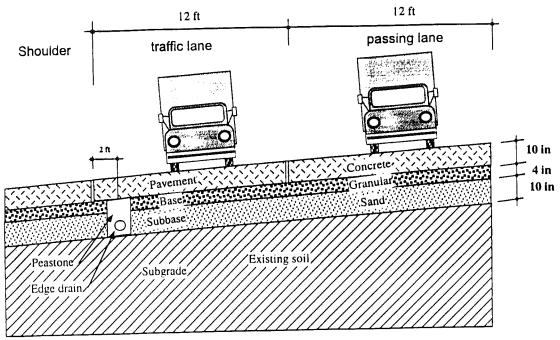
Typical view of pavement system cross-section for both the Lawrence and Galesburg projects.
